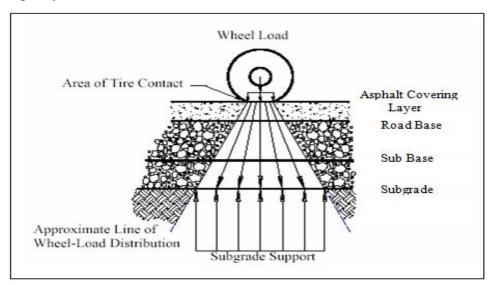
Distribution of Load Stresses in Flexible Pavements.
